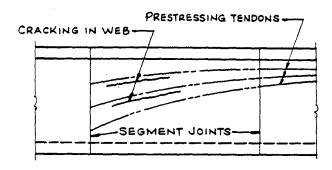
Thermally Induced Cracks in Box Girder Slab
